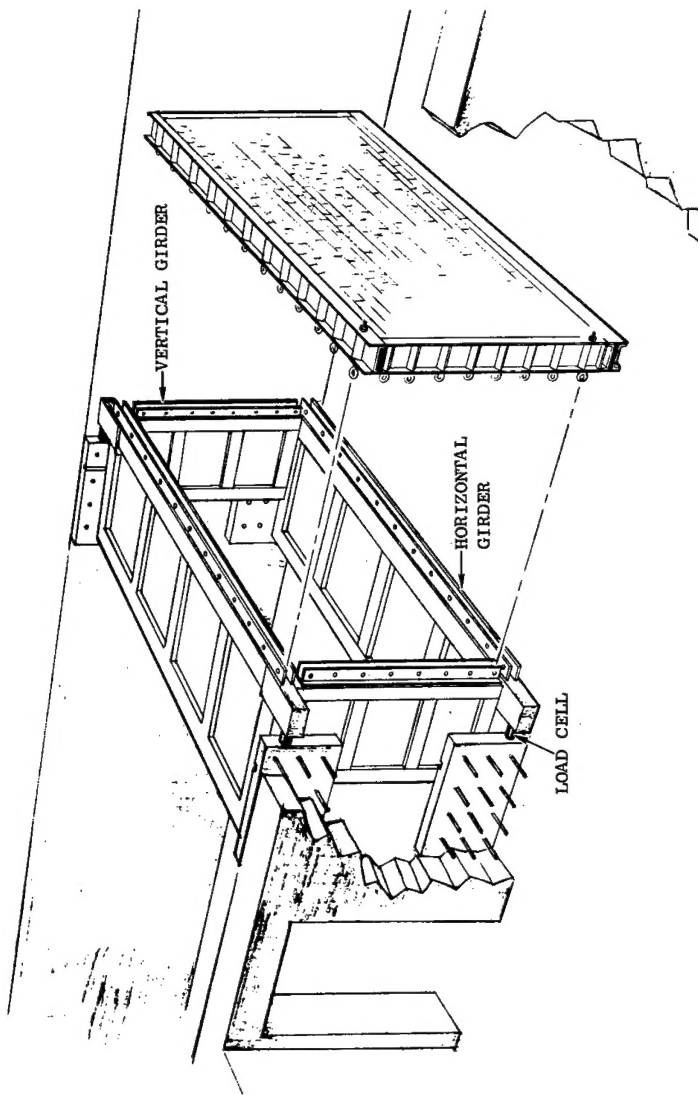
Cutaway View of Shock Tunnel Showing Test Panel and Location of Horizontal and Vertical Plate Girders, Wall Blocks, and Load Cells
